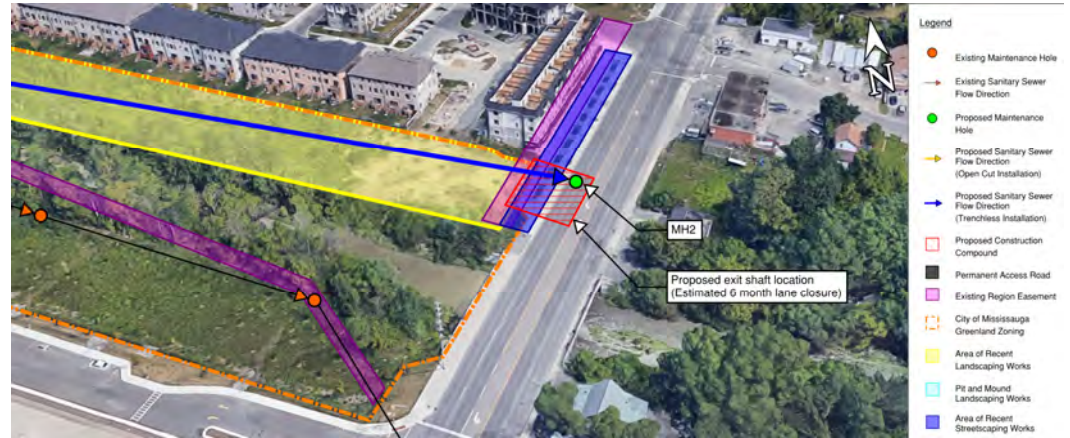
Alternative 3B – Exit Shaft Location on Lakeshore Road East
